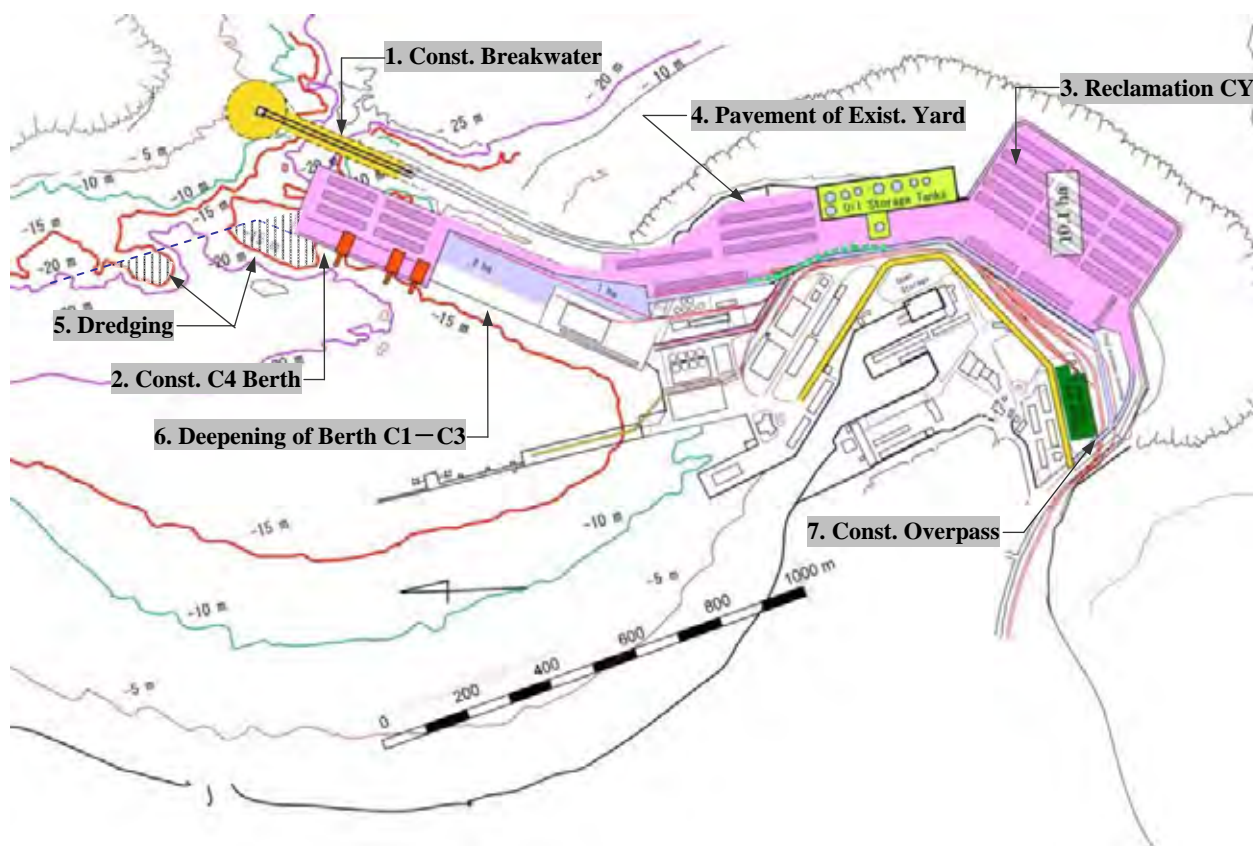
Project Layout Plan (Urgent Plan)
